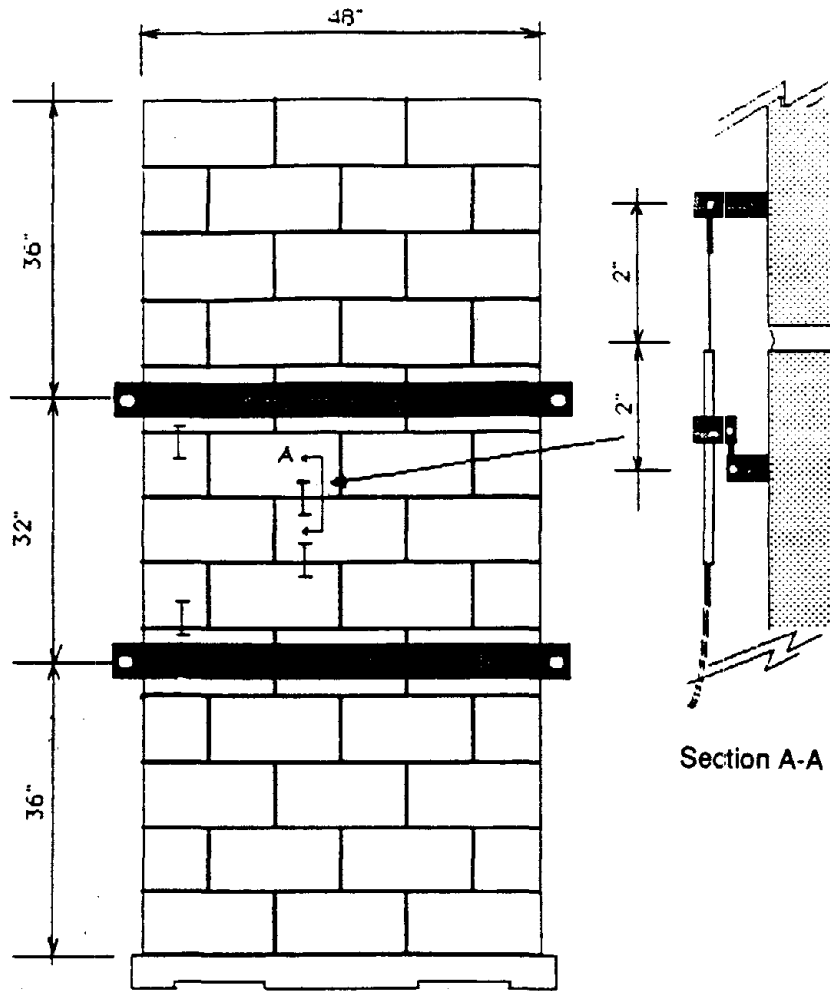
Locations of the L.V.D.T's on the Wall Panels
